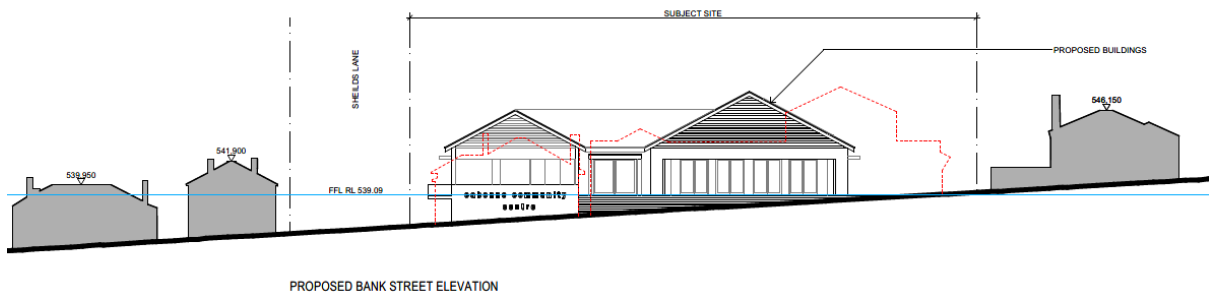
Extract from Plans showing the existing and proposed Bank Street Elevation
